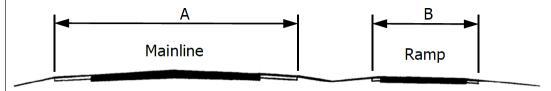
Approach roadway cross-section view for a mainline and a ramp that are carried across separate bridges.
